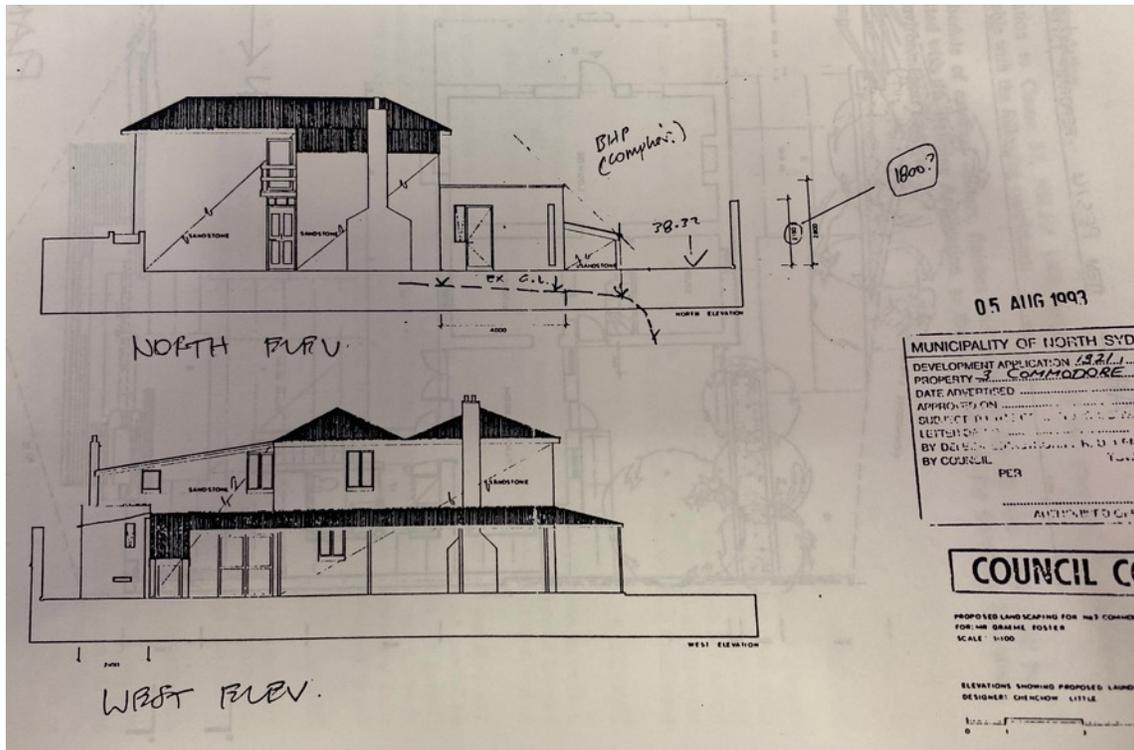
, Chenchow Little Elevations, submitted to North Sydney August 1993
